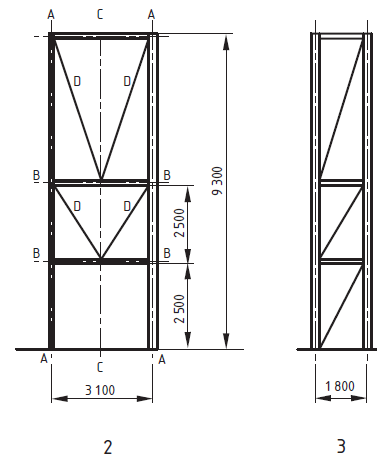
Location of thermocouples for a cladding test (dimensions in mm)
